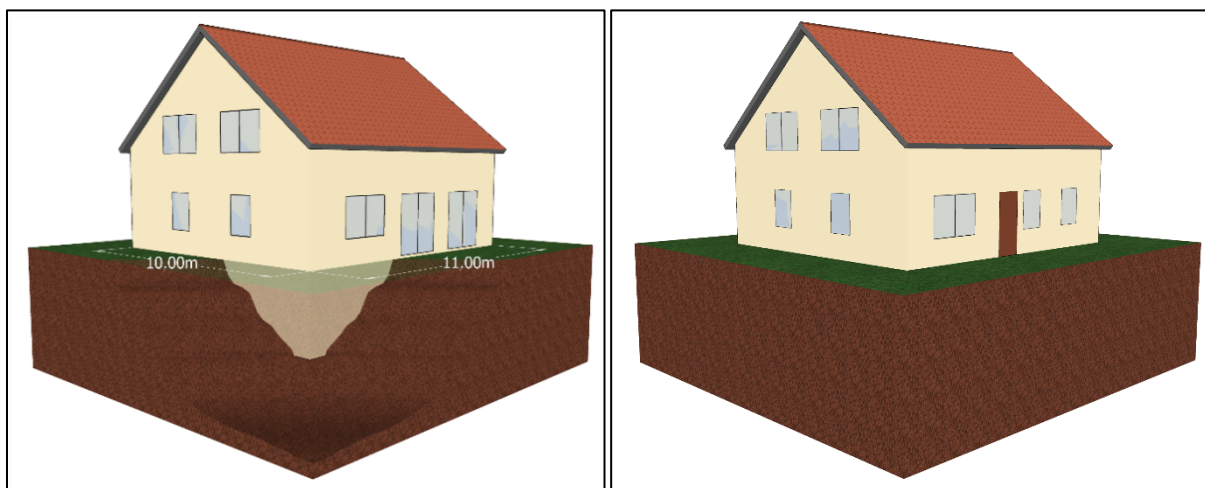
Model building of a detached house, south-west elevation (left) and north-east elevation (right)
